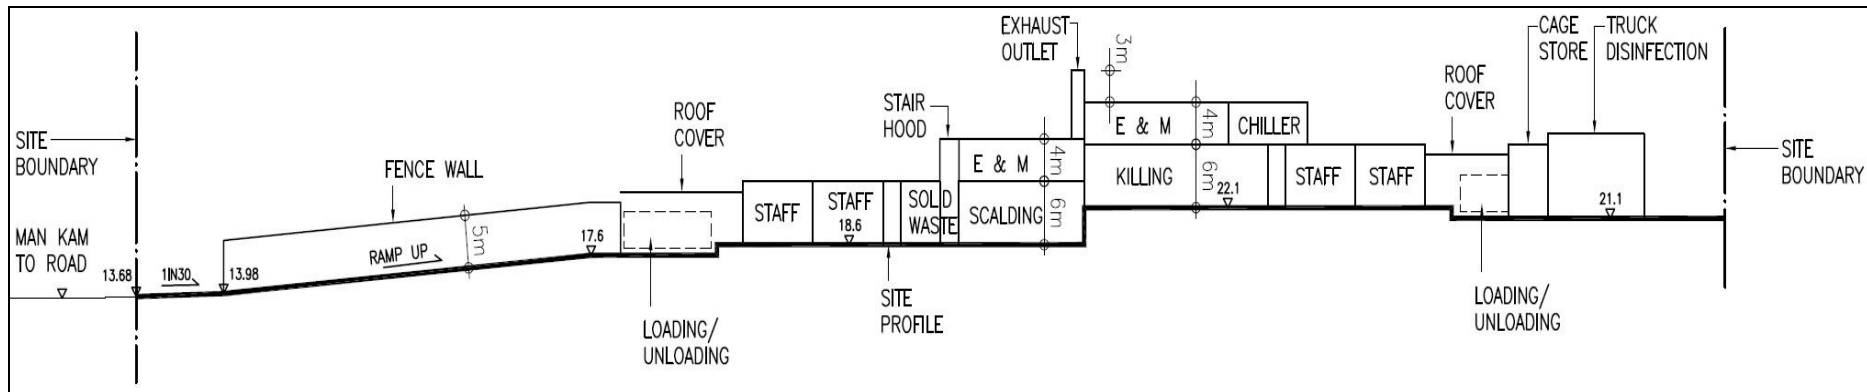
PSC Conceptual Design – Elevation (Section A-A from Figure 2-3)
